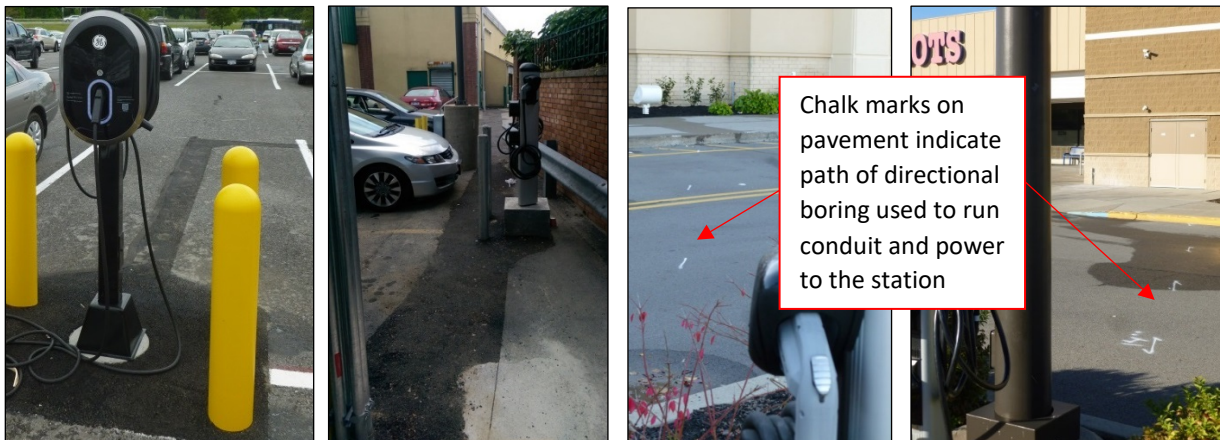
Parking lot pavement examples of cut/repair (left) and tunneling under (right)
